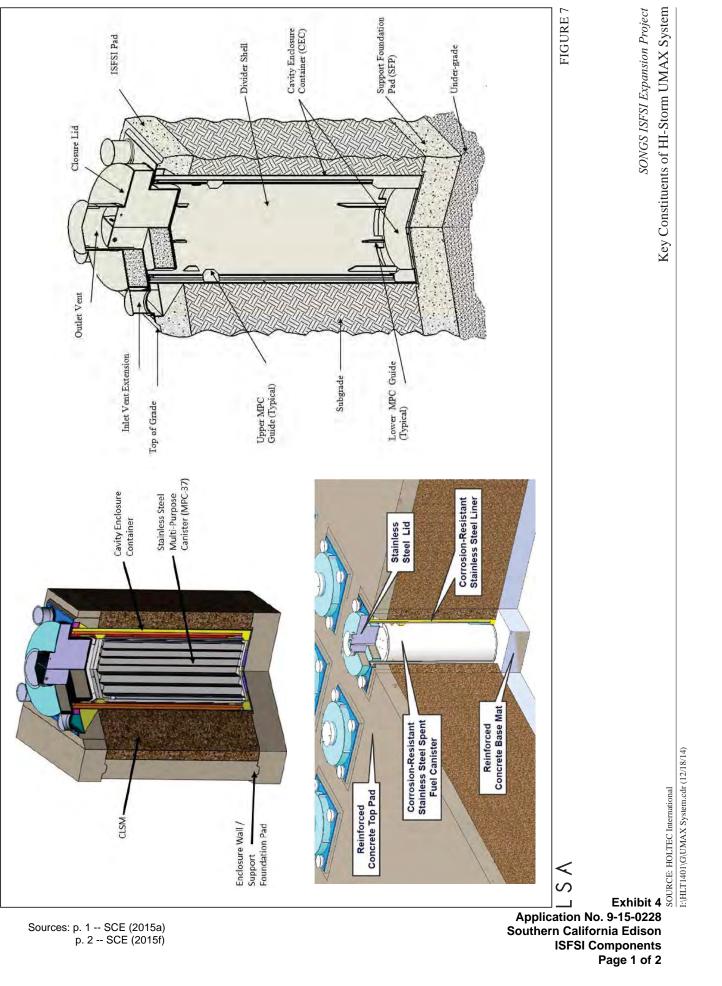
Cross section illustration of the concrete pads and storage modules. The space between the cylindrical storage modules is filled with a flowable grout material.
